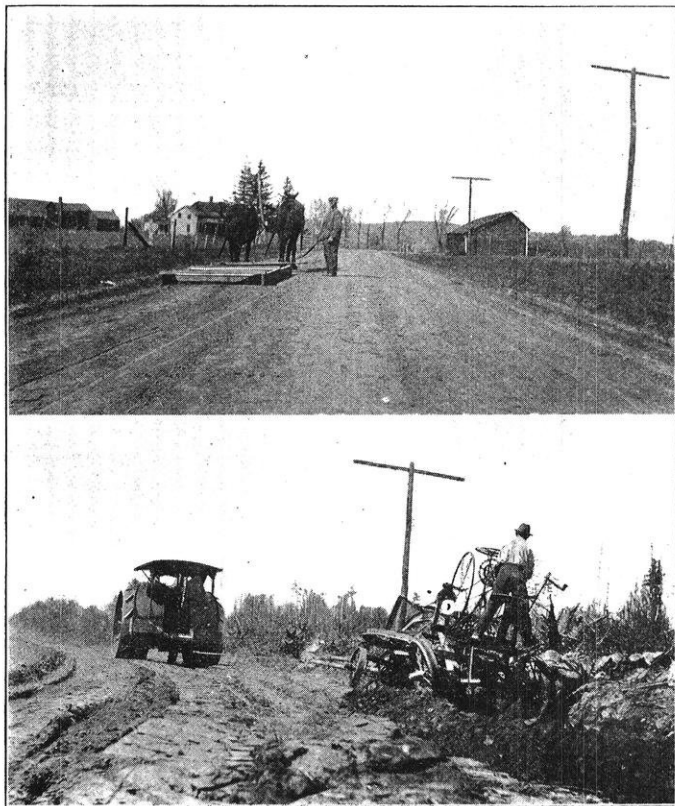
A patrolman on Trunk Highway No. 33, Sauk County, just having completed his second round trip with a road planer on an earth road, immediately following a twenty-four hour rain. Note how well the ruts are filled and the surface smoothed up.
